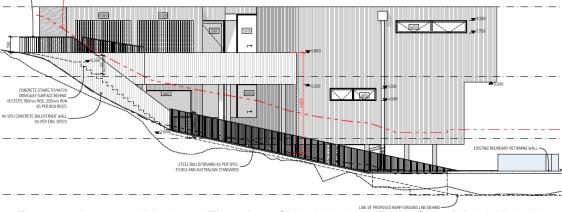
Approved Northern Elevation of No.4 Lindsay Place from BA-2018-1742
